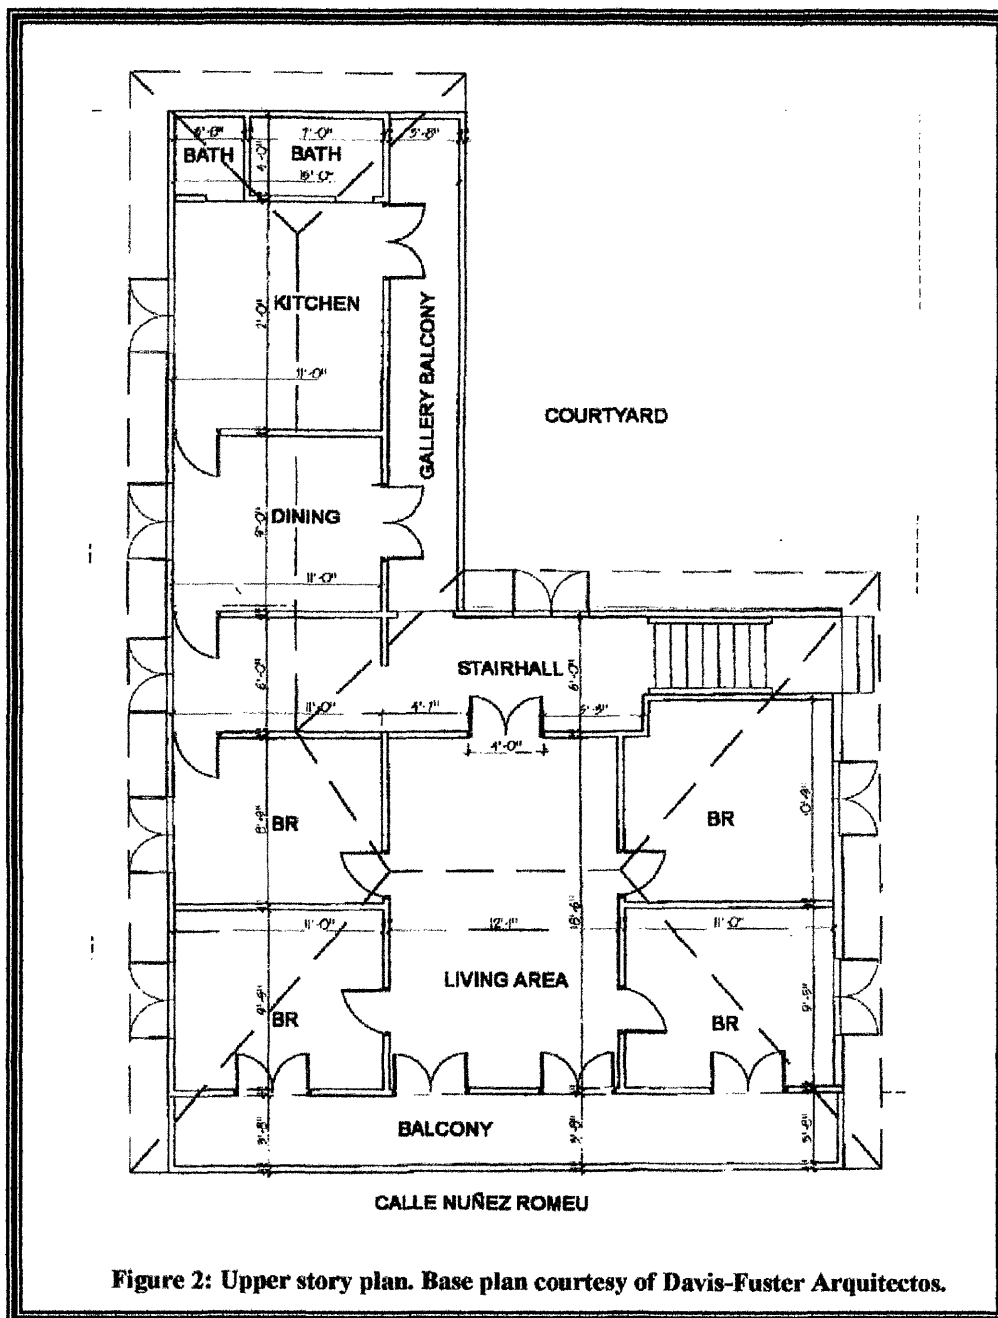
Upper story plan. Base plan courtesy of Davis-Fuster Arquitectos.
